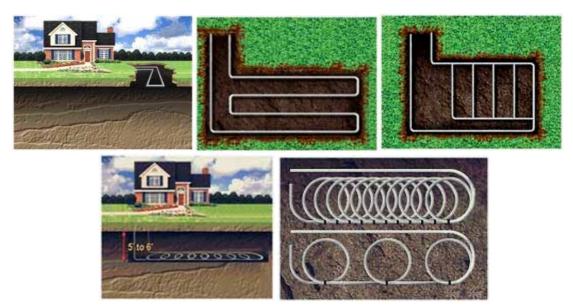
Horizontal Ground Collector Heat Exchangers for Ground Source Heat Pump. Top Middle: Plan view of a 'Series' Collector, Top Right: Plan View of 'Parallel' Collector, Bottom 'Slinky' Coil Collector. (Alliant)
